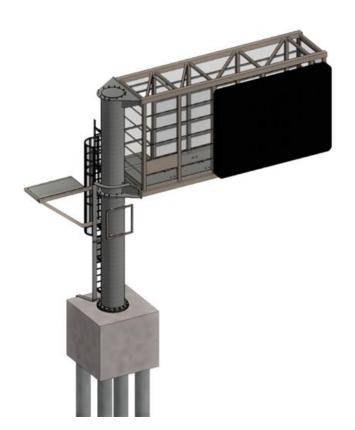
CAD Images of the standard accessible MS4 gantry superstructure on typical scheme designed concrete plinth and piled foundations [1]
